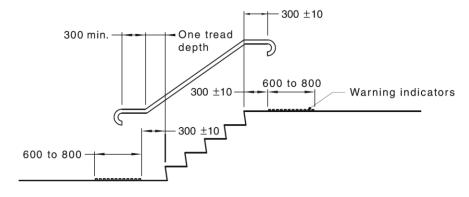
Handrail Details - Section 10.3 of AS1428.1-2009
